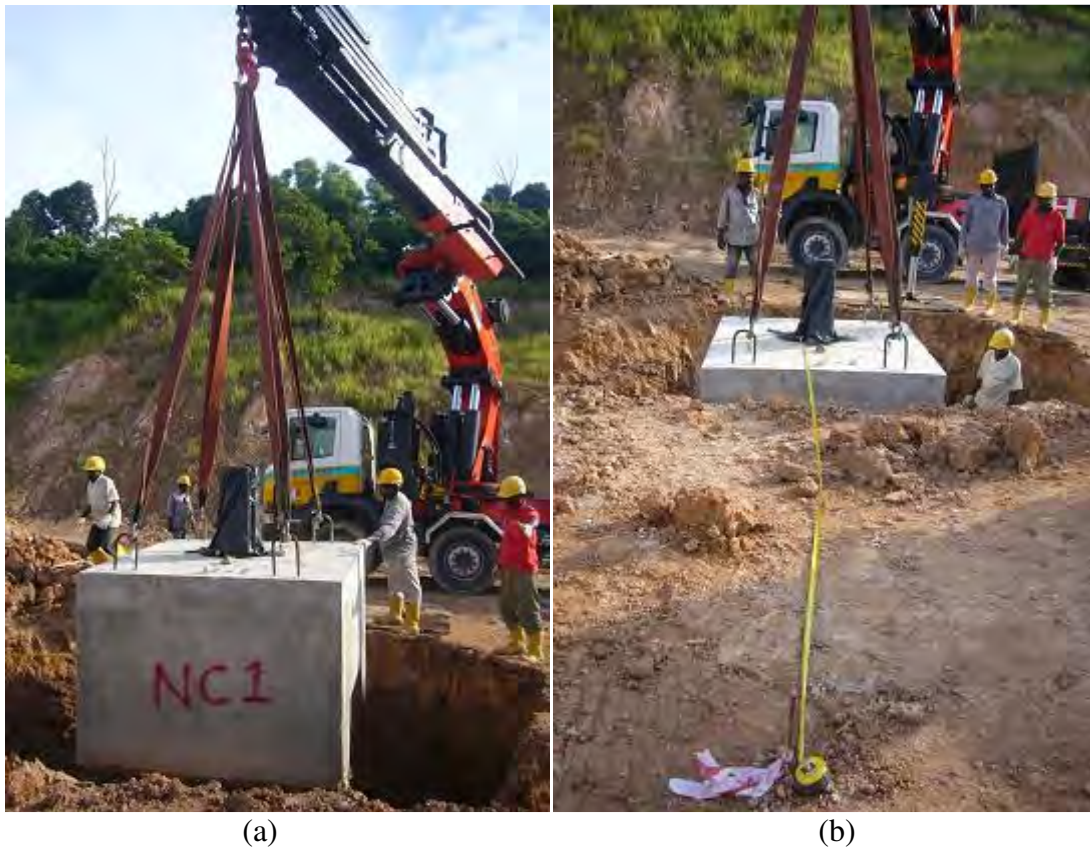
(a) Installations and (b) Positioning of specimens on site
